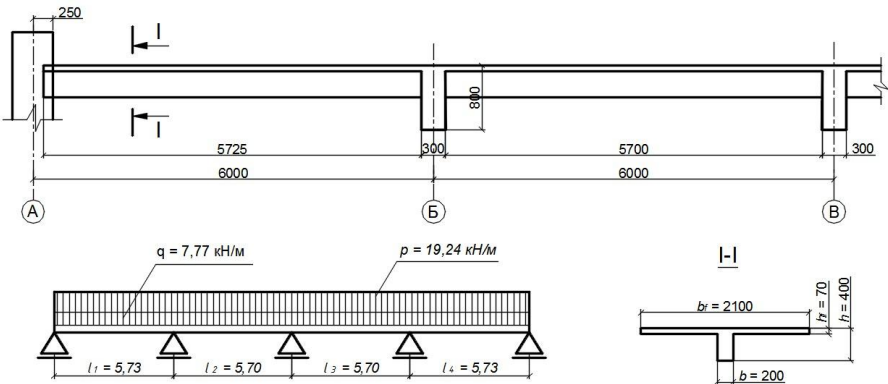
Design spans, cross-section and diagram of a secondary beam
